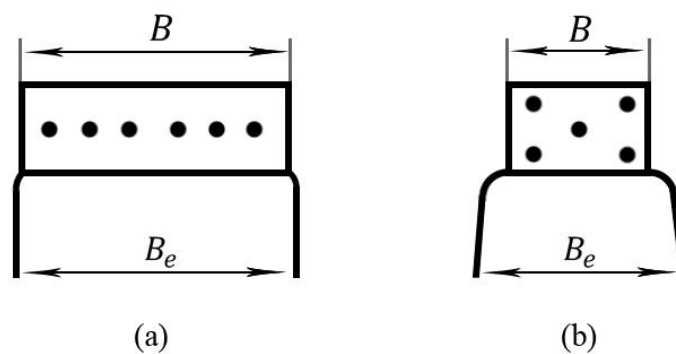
Plan view of a (a) relatively long abutment wall and (b) pile cap, showing the extent of 3D edge effects
